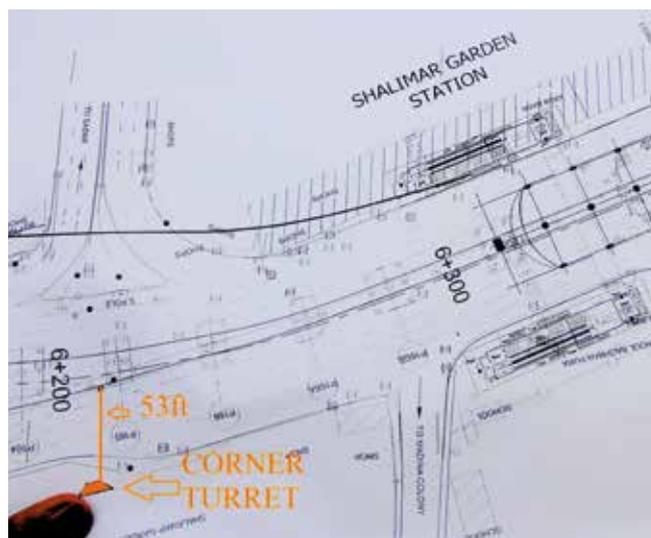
Nespak Map showing raft at 53 feet from turret of Shalimar wall, the Viaduct will be approximately 30 feet from the wall at this point.
